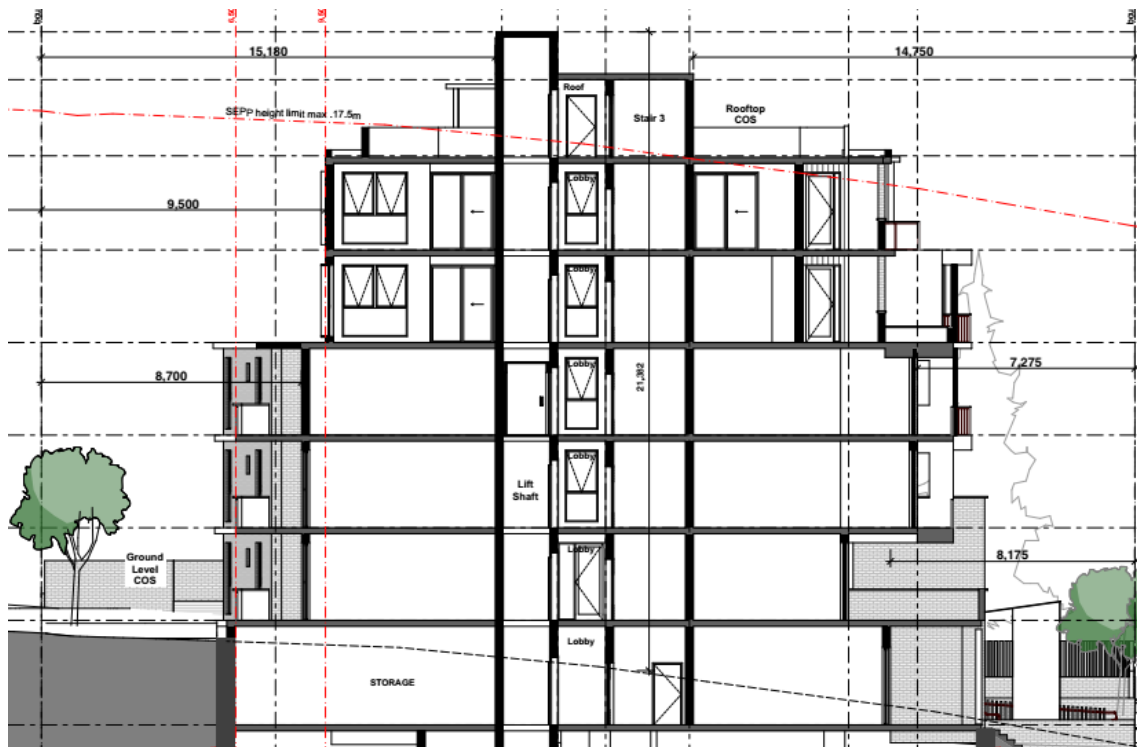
An extract of the north-to-south section plan of the proposed development; the 17.5-metre height plane is denoted by the dashed red line.
